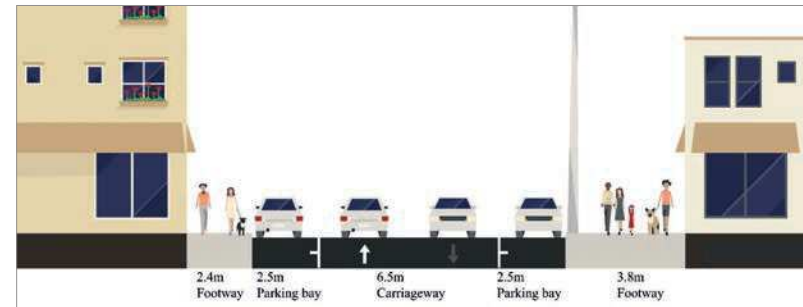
High Street Existing (with side street parking) (© Street Mix)
